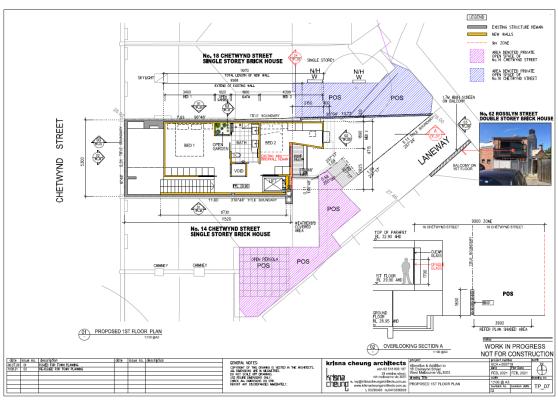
First Floor Plan (source: Krisna Cheung Architects Pty Ltd)
